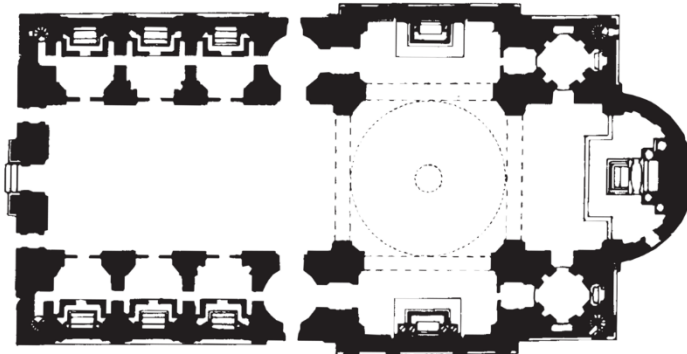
Plan IL Gesu 1639-1641 A.D. (Vold, 2021)
